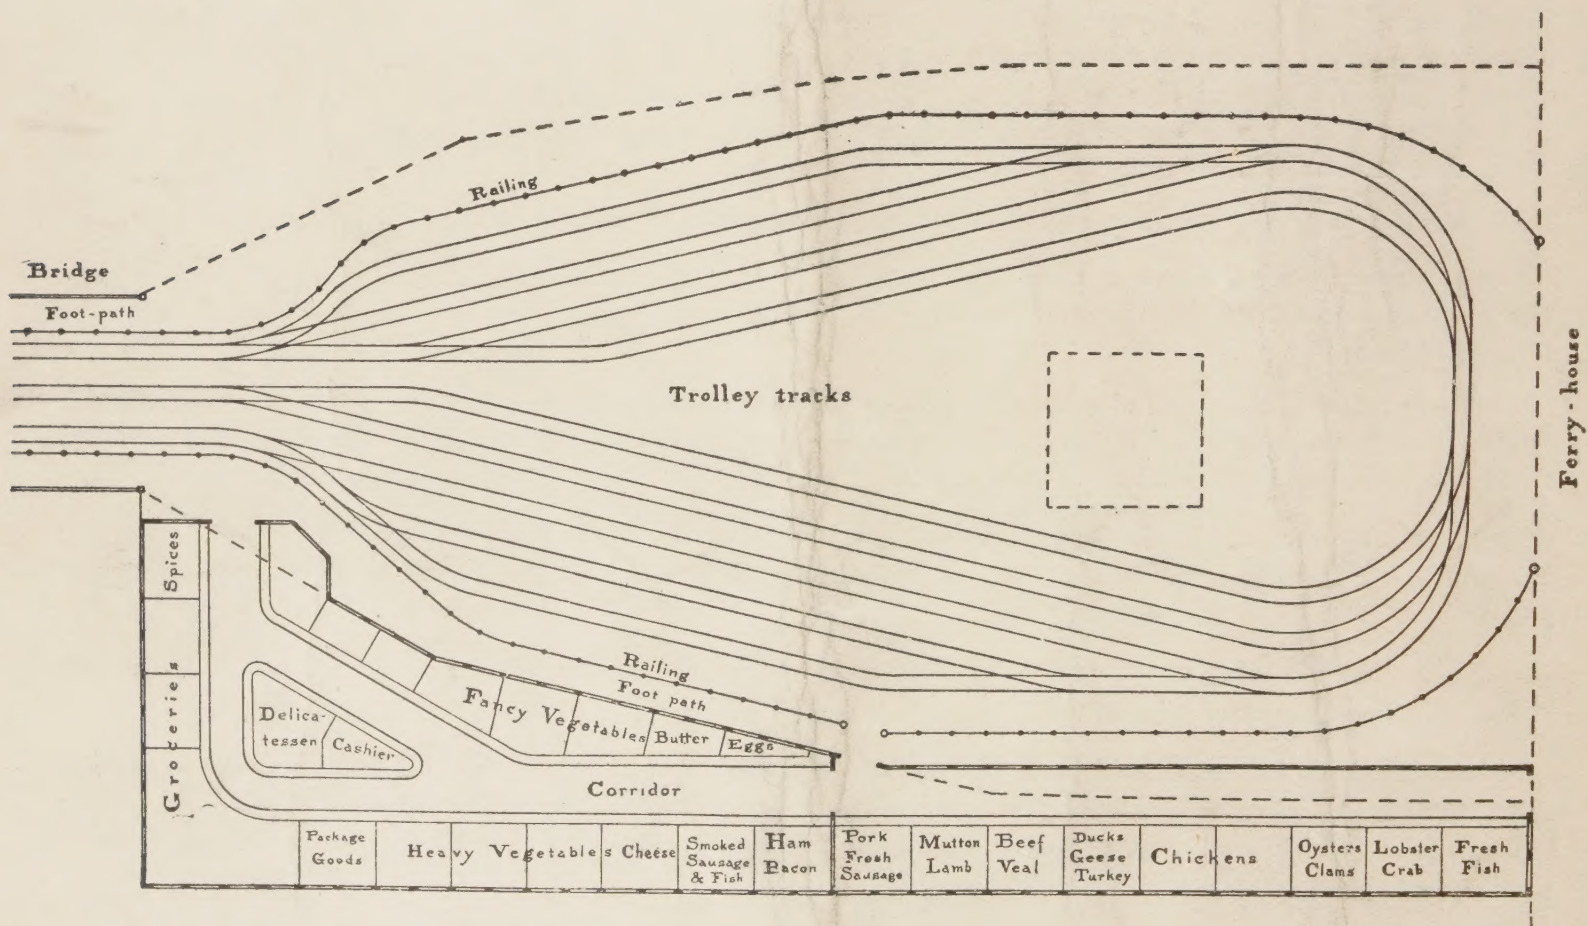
Plan View. Scale: 1 inch - 64 feet
